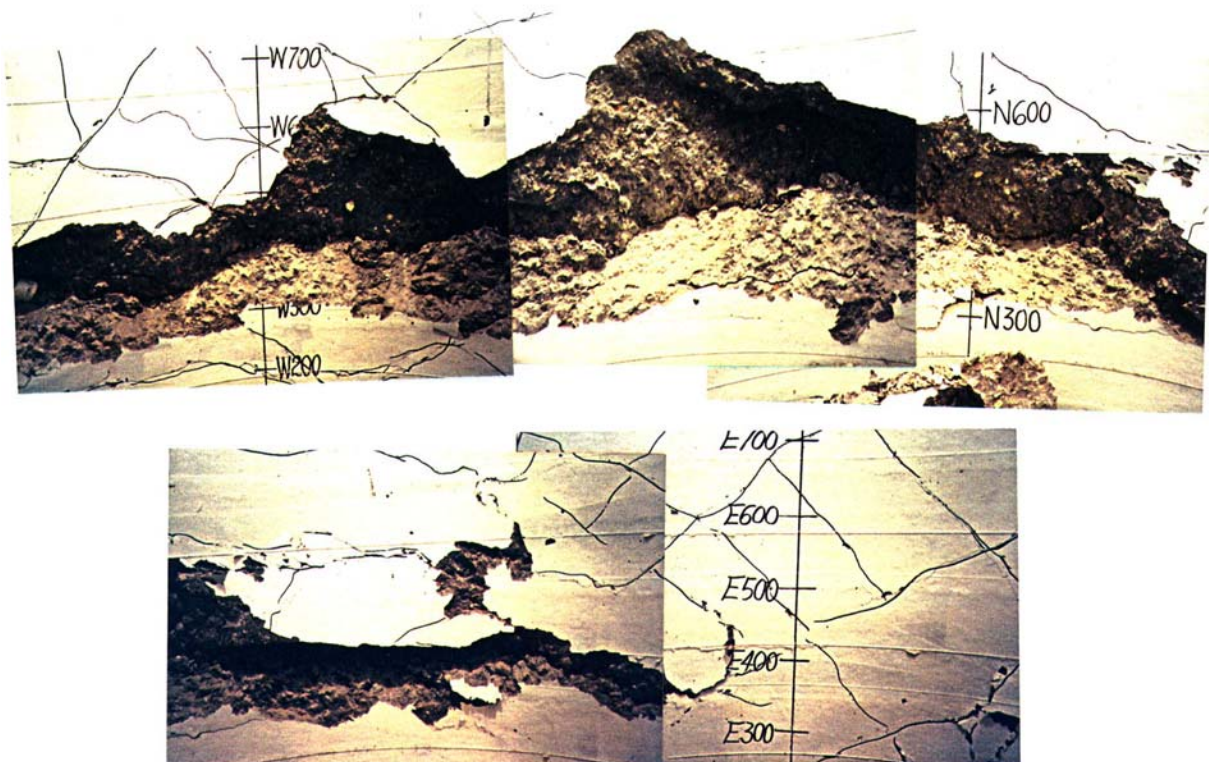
Panoramic View of Inside Face Concrete after Testing (E-N-W)
